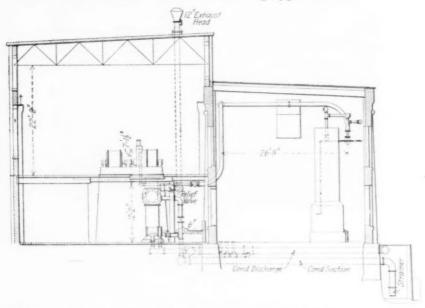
ELEVATION OF POWER PLANT FOR SALMON FALLS MANUFACTUR-ING COMPANY
